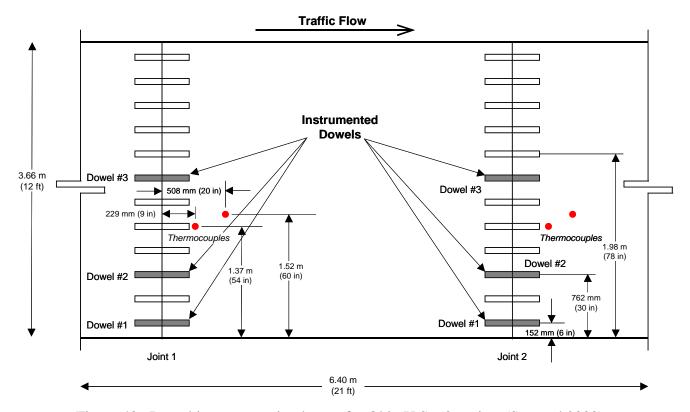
Dowel instrumentation layout for Ohio U.S. 50 project (Sargand 2000).
